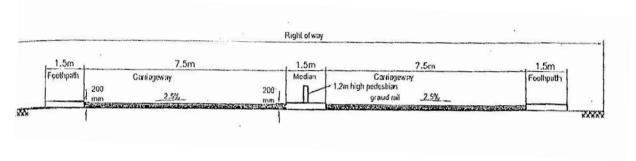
TCS 2.2 4-Lane divided Carriageway with Footpath (Built-up area)
